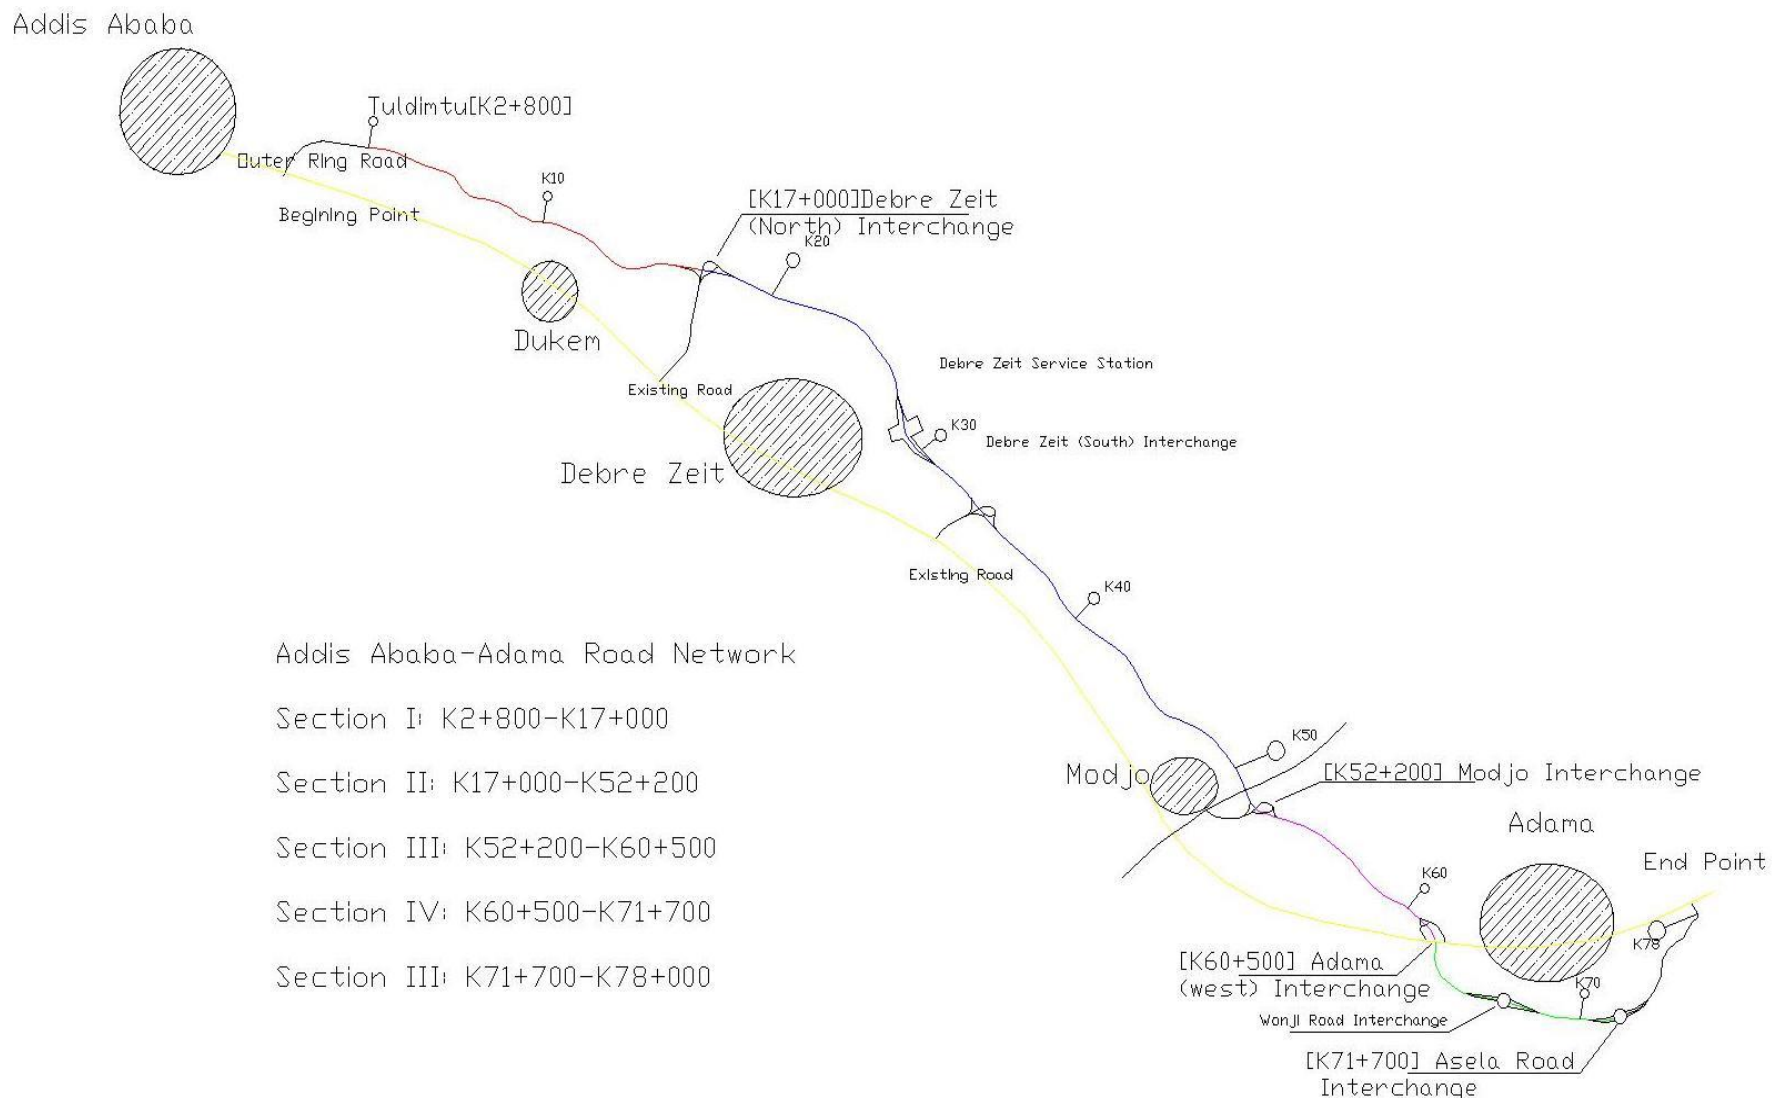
AAAEW Road Link and Study Sections (No Scale)
